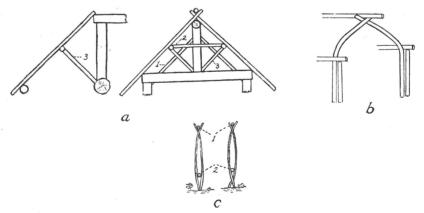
Details of construction of roofs and fences: a, arrangement of braces at side and end in house of Tumaraa, Raiatea: 1, oblique strut; 2, collar beam; 3, oblique strut to purlin; b, manner of supporting ridgepole of boathouse; c, fence of tamanu rods 33 inches high at Maupiti: 1, upper rails in cross section; 2, lower rail.
